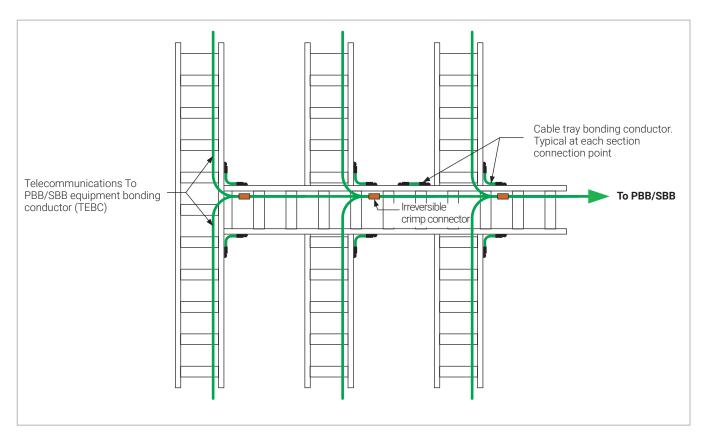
Typical Arrangement of Cable Tray Bonding and TEBC connections
